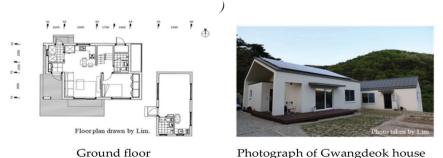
Floor plan and south facade of Gwangdeok house (Lim et al., 2021, 6410)
